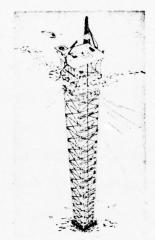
Exxon's Guyed, Compliant Steel Tower
